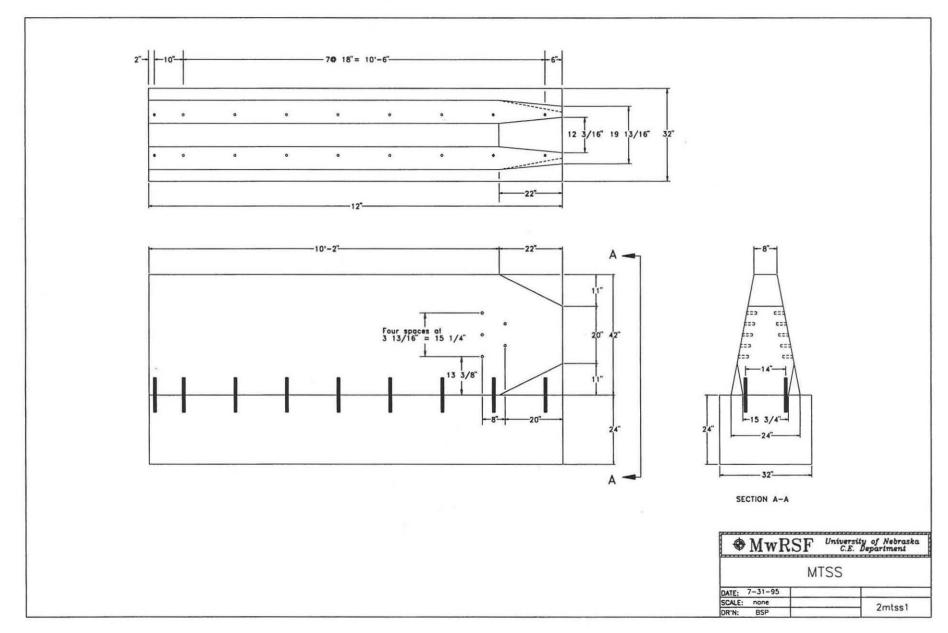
Cross Section and Dowel Configuration of the Single Slope CMB
